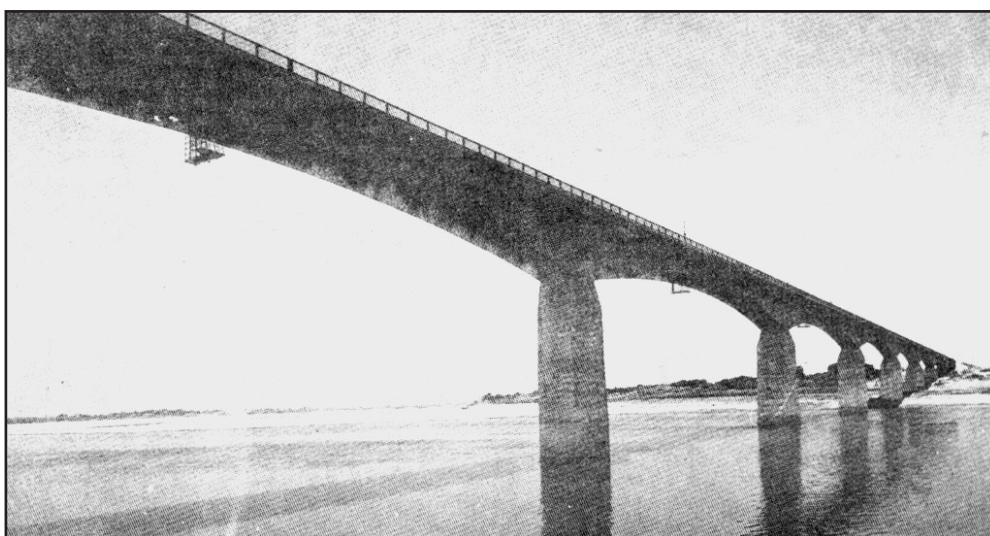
Bridge on river Yamuna at Kalpi, U.P., the deck of which is monolithic with the piers and was built in-situ by the free cantilever method
